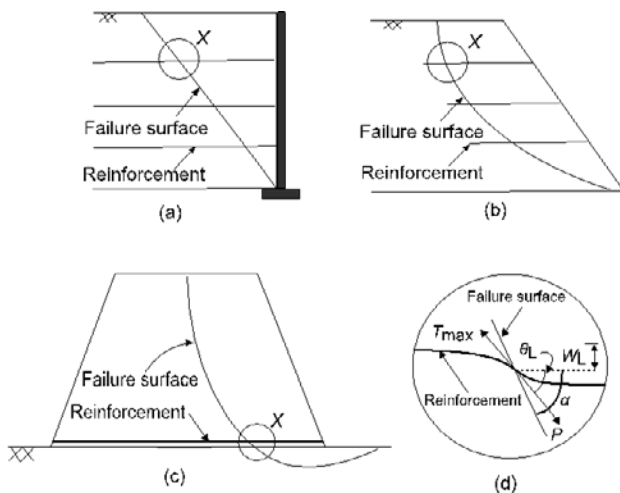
Kinematics of failure of reinforced structures: (a) reinforced soil wall; (b) reinforced slope; (c) embankment; and (d) enlarged view at X.
